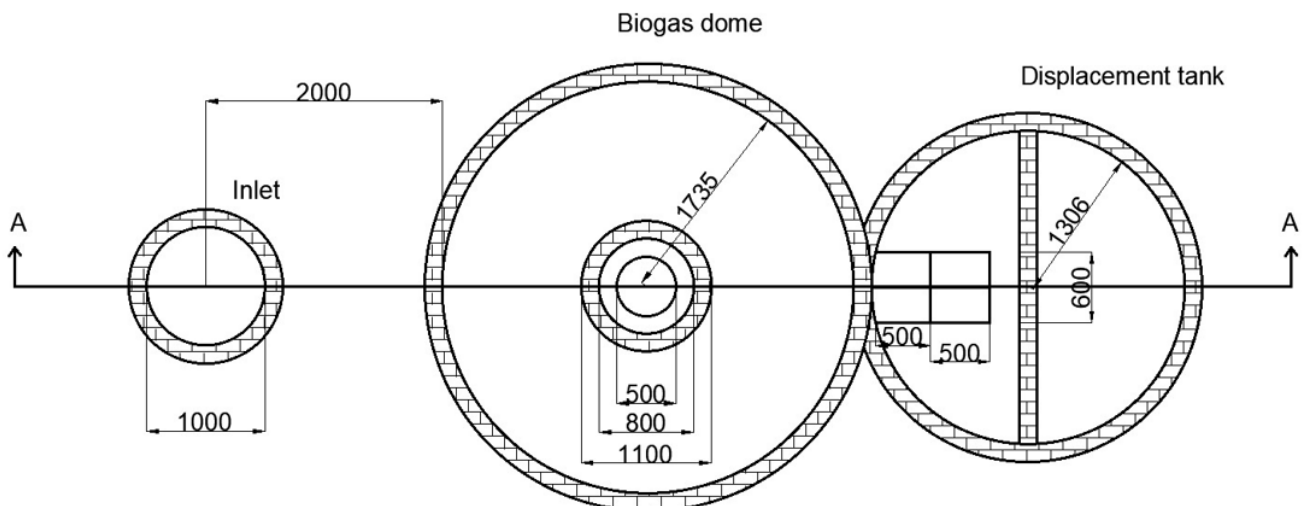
Fixed dome brick material boo gas design: Plan drawing
